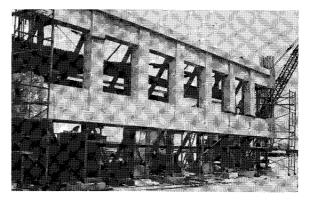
End section of truss in precaster's yard showing anchorage ducts for post-tensioning.
